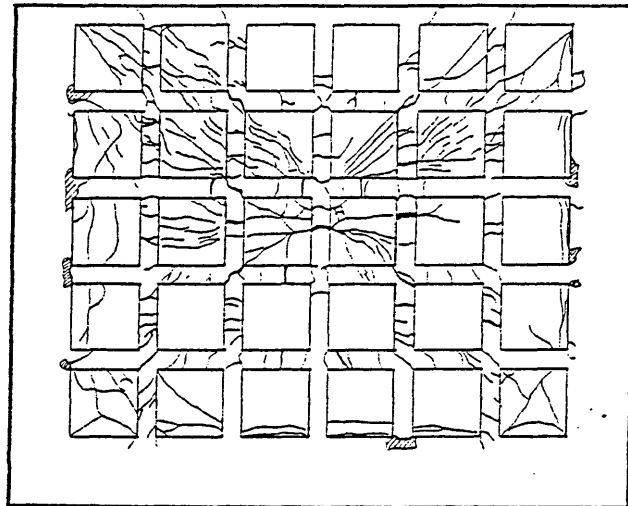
Failure Crack Pattern of R.C.Waffle Model Slab E3
